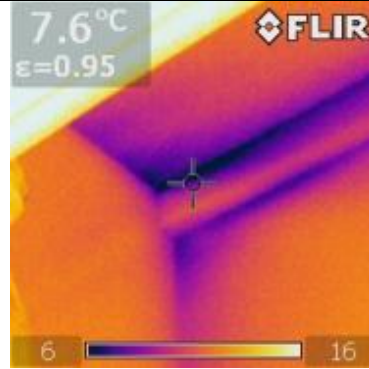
Leak through external wall in ceiling angel inside kitchen cupboard.
